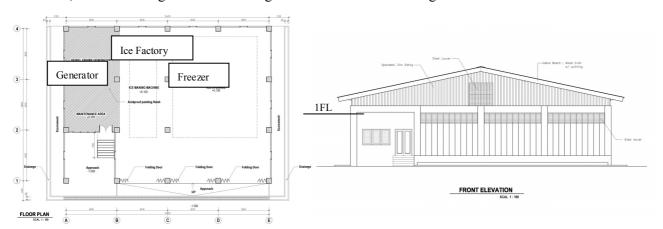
Ice Factory Floor Plan 28.7 m (W) x 20.35 m
